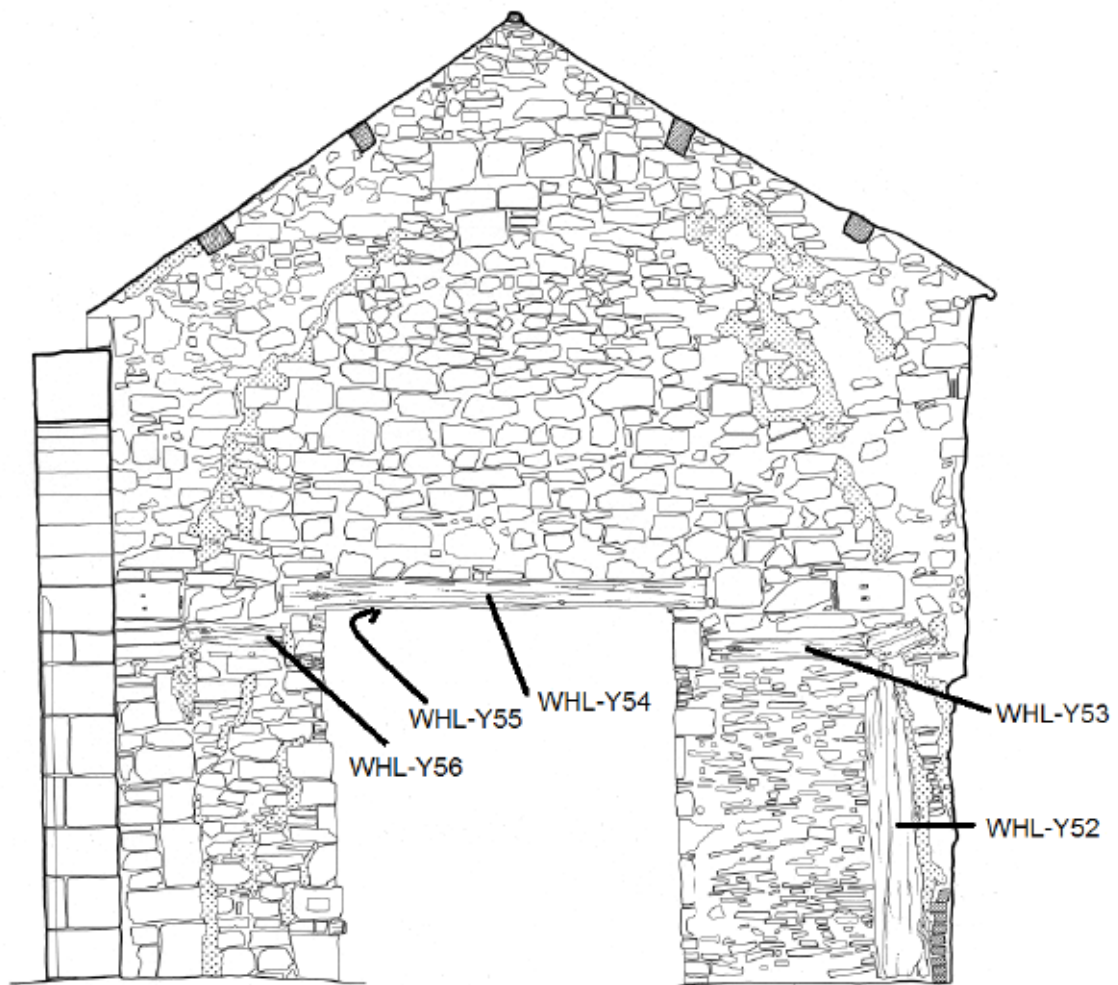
Dividing wall between carriage house and lobby (east face), showing the location of samples WHL-Y52–56 (LUAU 1997)
